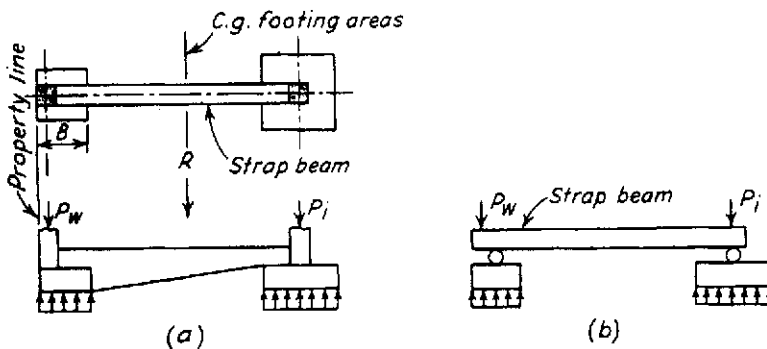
Diagram illustrating (a) forces acting on cantilever footing. (b) Principle of cantilever footing.
